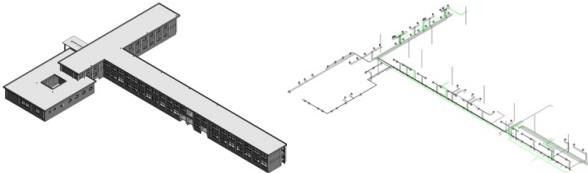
BIMs of the lecture building's architecture elements (left) and BIMs of the lecture building's MEP elements (right).
